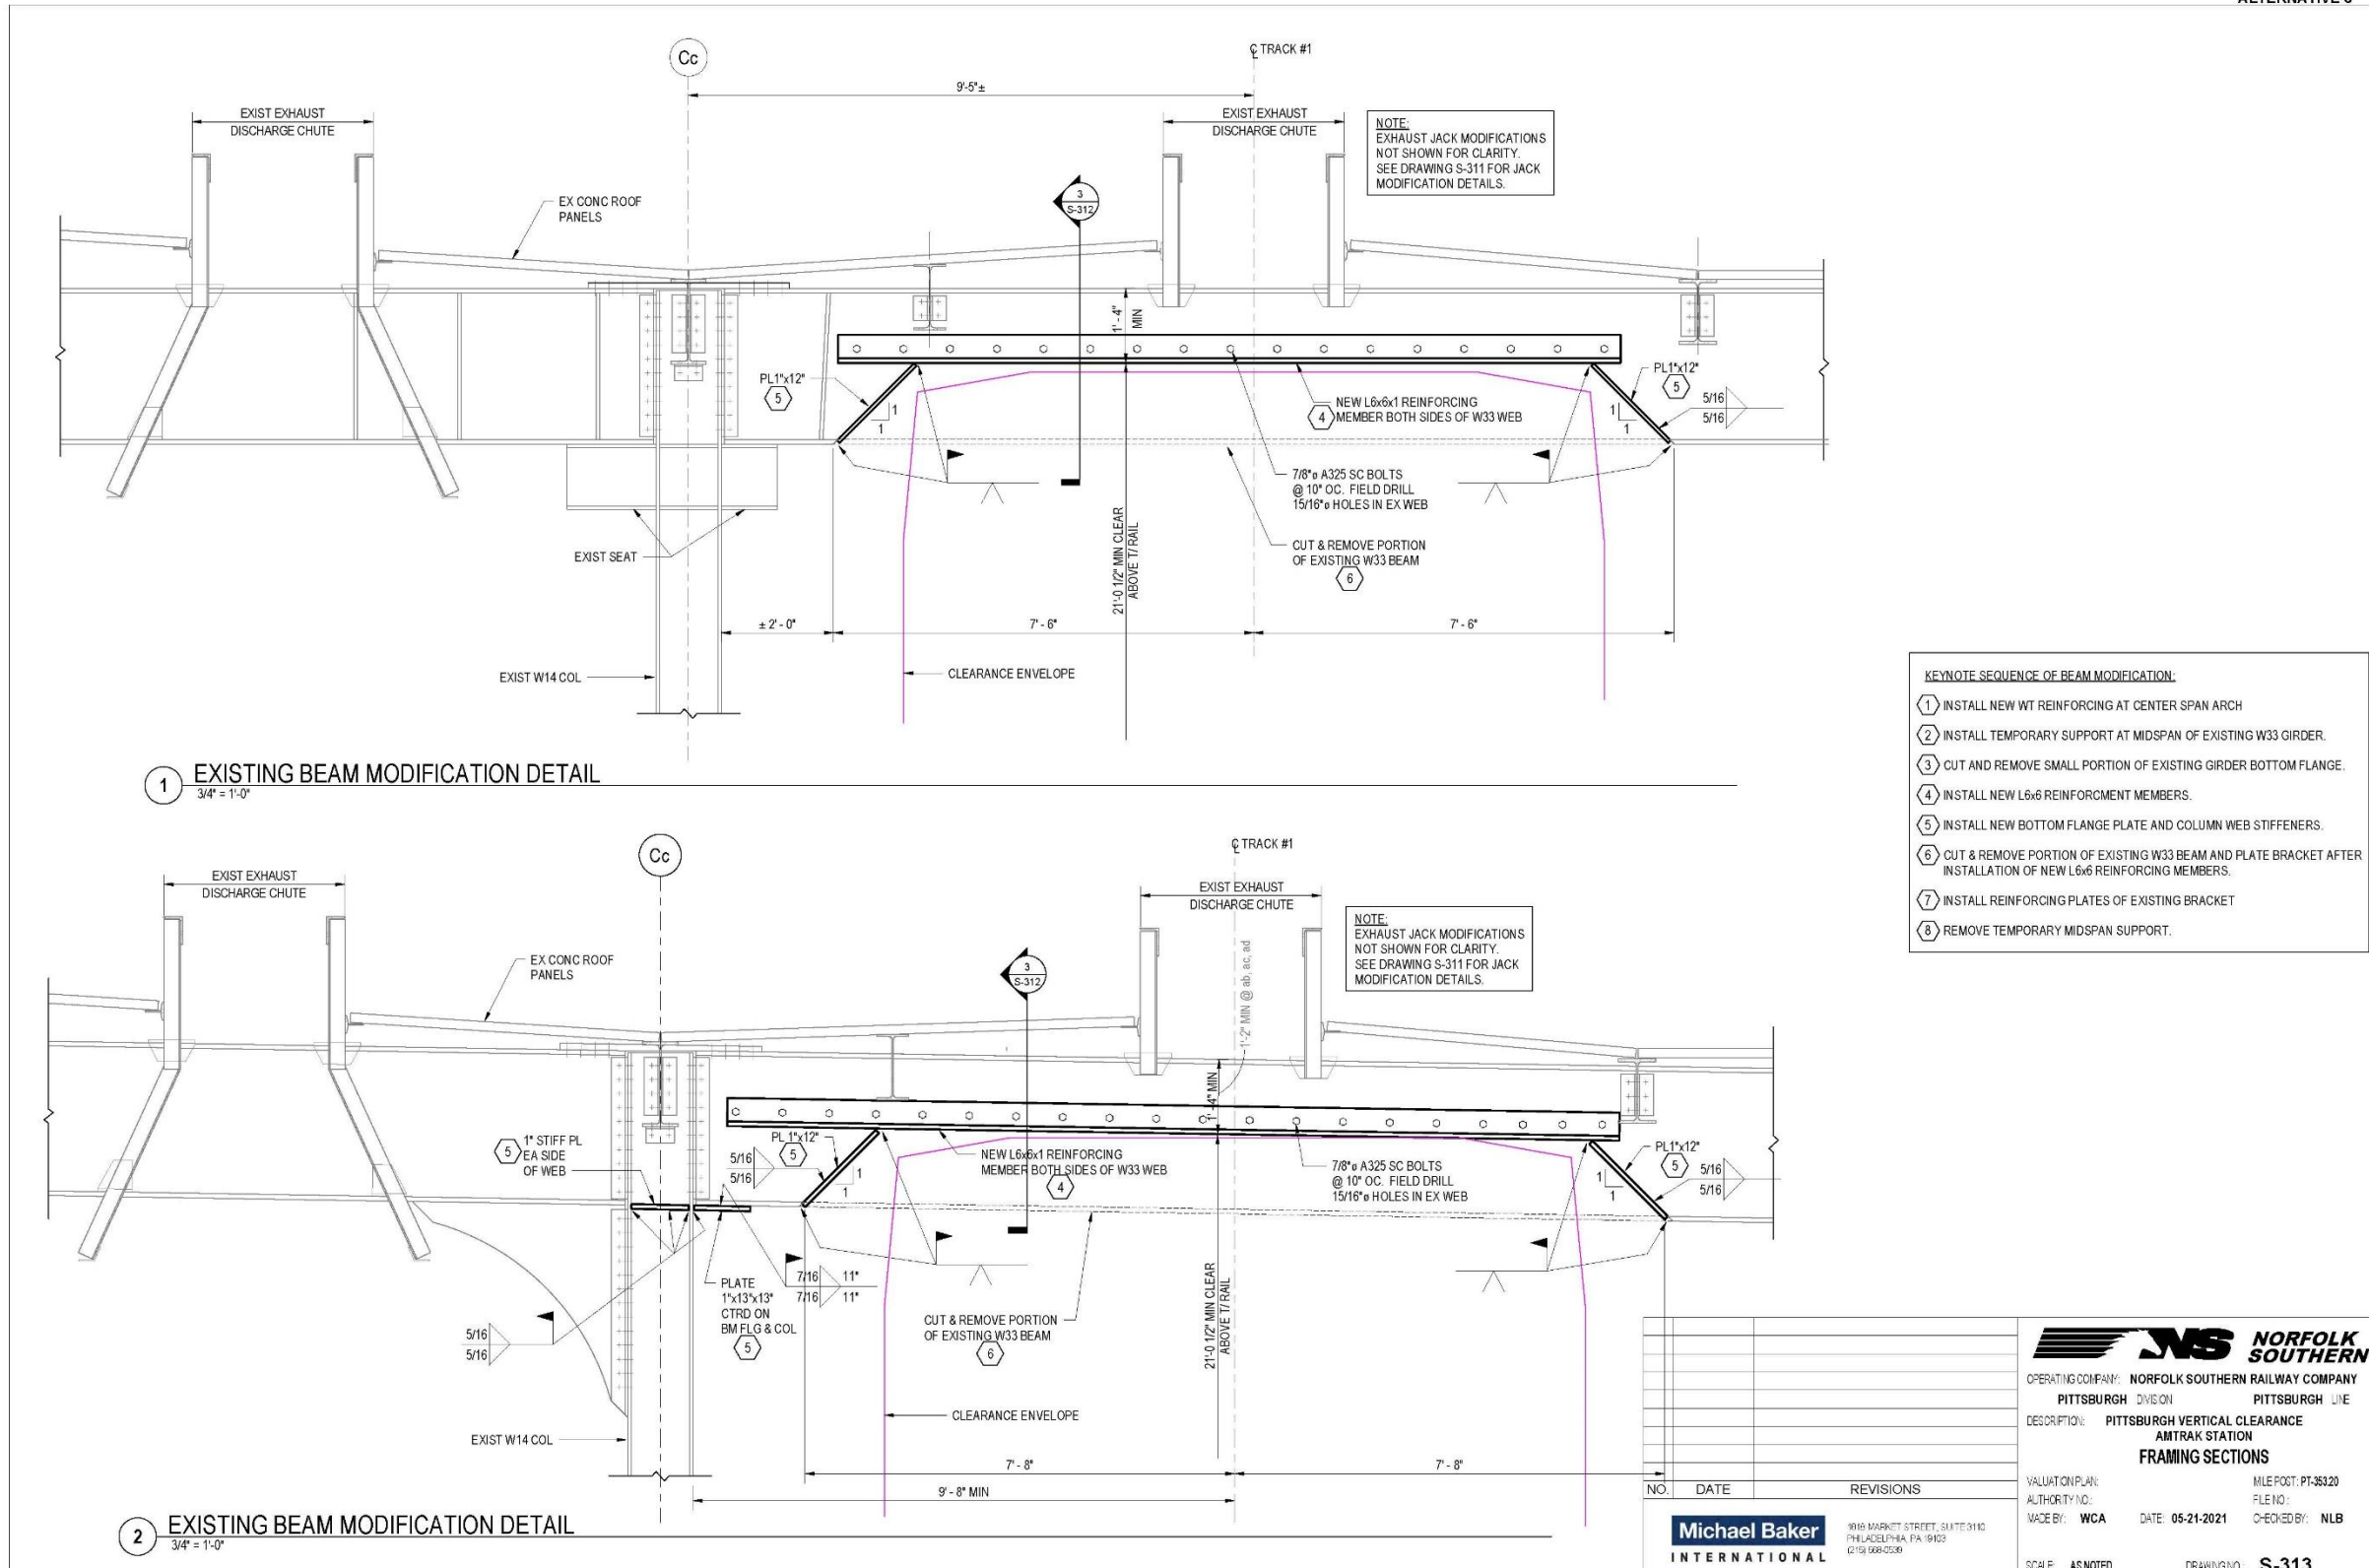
Plan sheet showing modifications to beams over track 1.
